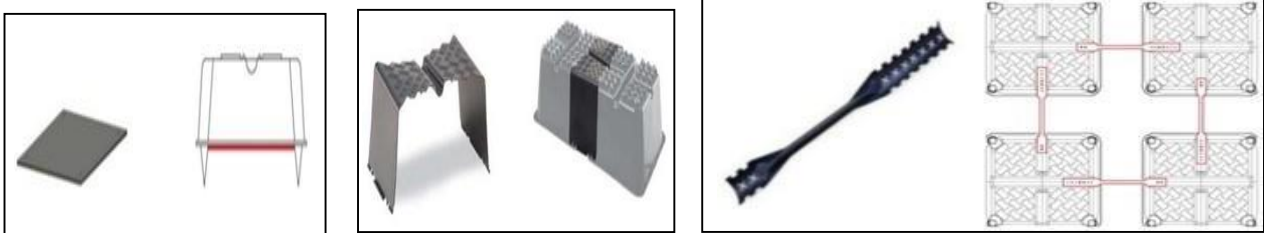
Connection Bridge, Spacer Joint, Closing Plate
